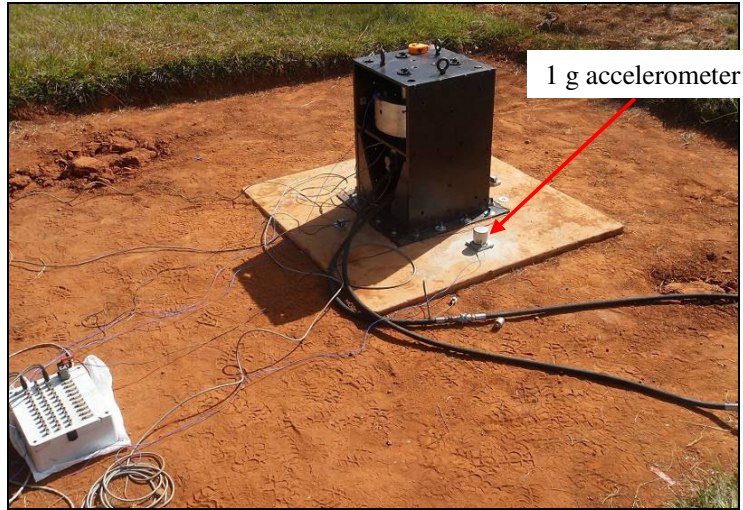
Test setup for full-embedded footing – 1240 mm
